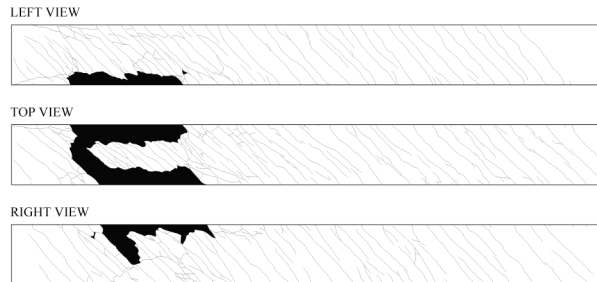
Cracking pattern: Beam E-1.33-1.0-0
